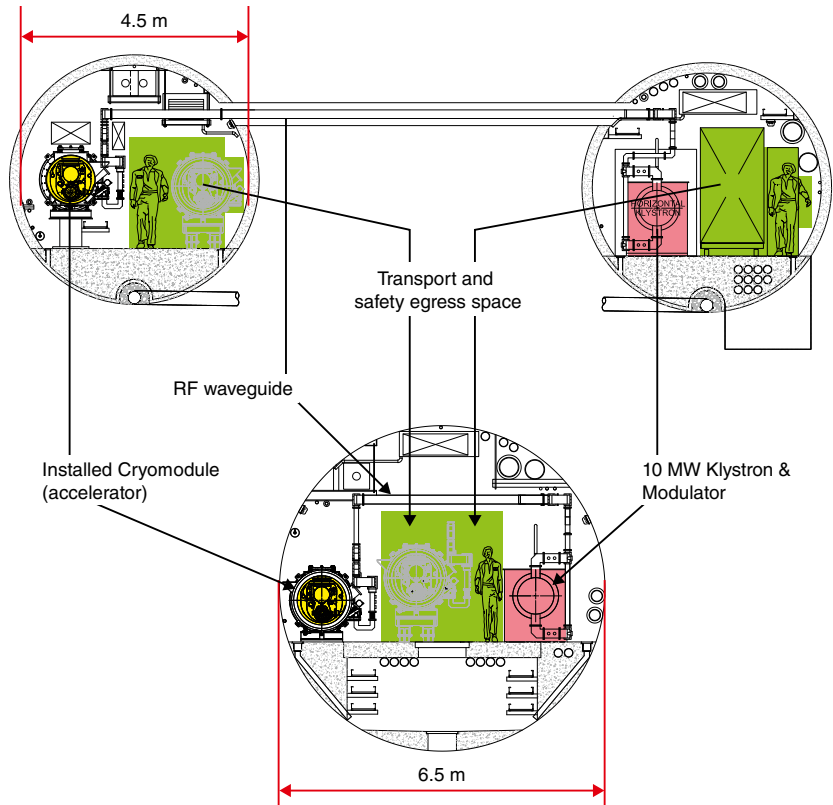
A detail of the Central Region tunnel showing typical beamline installation.
